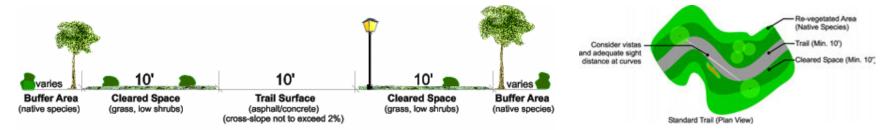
Plan and cross-sections views of an example greenway. Left Image: Example cross-section for a typical greenway. Right Image: A plan view of a typical greenway.
